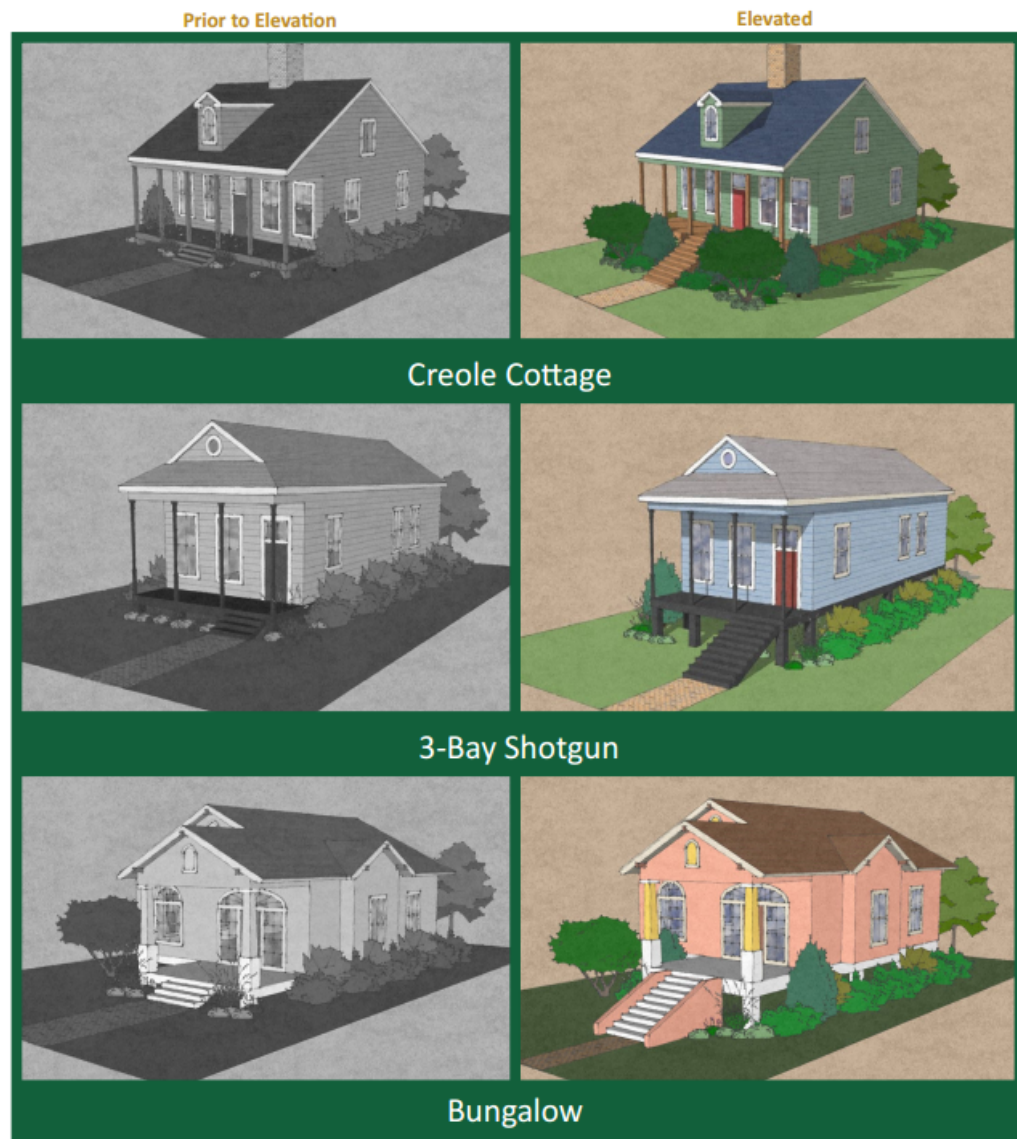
Elevations Models. 2015. Elevation Design Guidelines For Historic Buildings in the Louisiana GO Zone.
